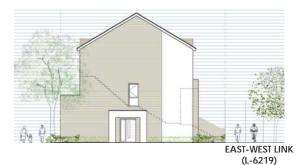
Proposed design for gable elevations of duplex buildings showing prominent entrance to ground floor units and windows of duplex unit ensuring aesthetic streetscapes and passive surveillance of public realm and communal areas adjacent. Source: MCORM, 2022.
